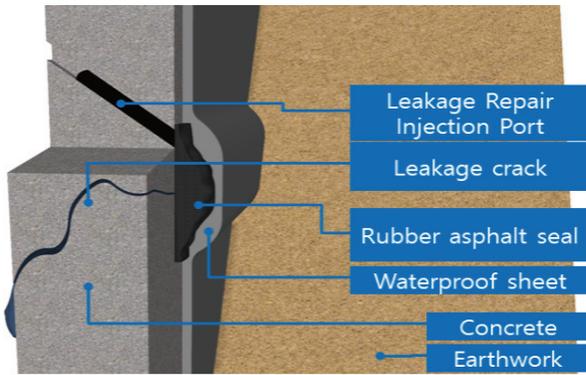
Structure leak repair method with waterproof layer on positive side of wall
